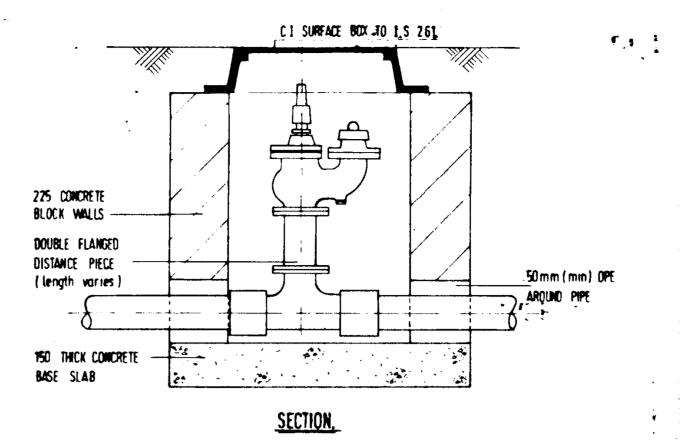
DETAIL OF A DUCK-FOOT FIRE HYDRANT.
